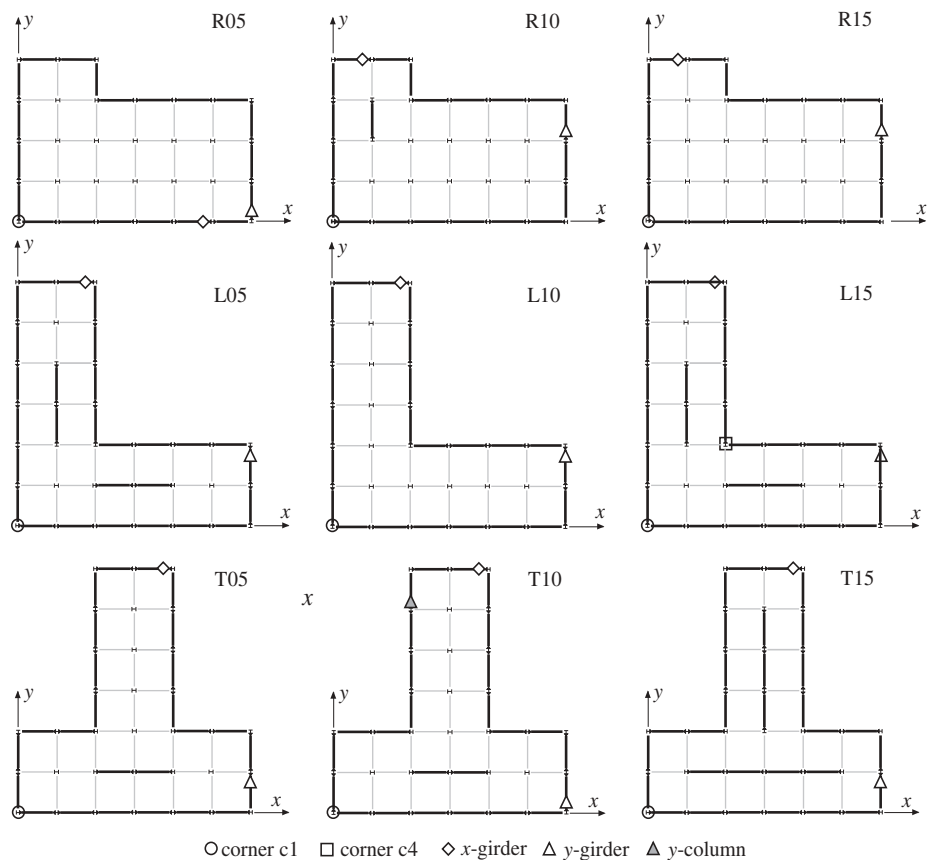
Plan views of nine asymmetric plan buildings. Marked corners and girders are selected purposely to measure maximum engineering demand parameters. Plan R stands for quasi-rectangular; plan T is symmetric about y-axis, and plan L is asymmetric about both x- and y-axes. Letters R, L, and T are followed by the number of stories; for example, R05 indicates a five-story rectangular plan building.
